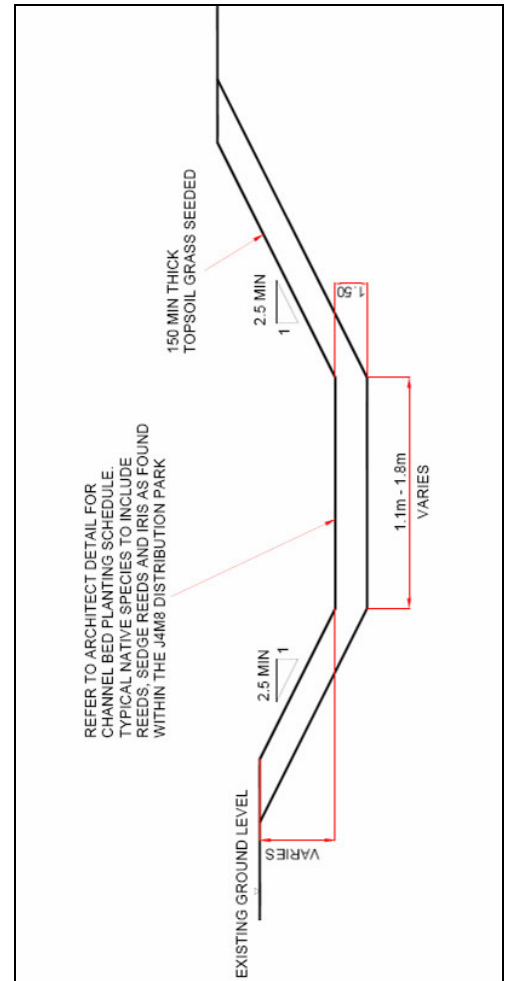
Conveyance swale and filter strip adjacent to industrial access road
